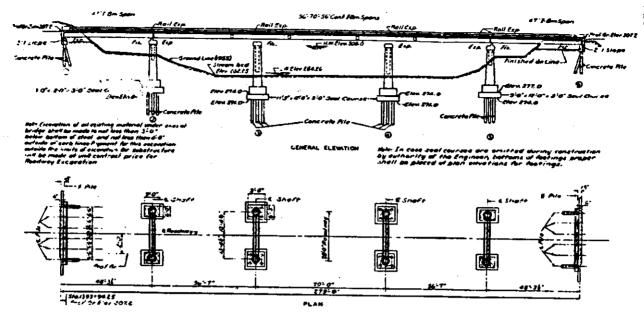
Bridge General Elevation (Old Wahite Ditch Bridge)
